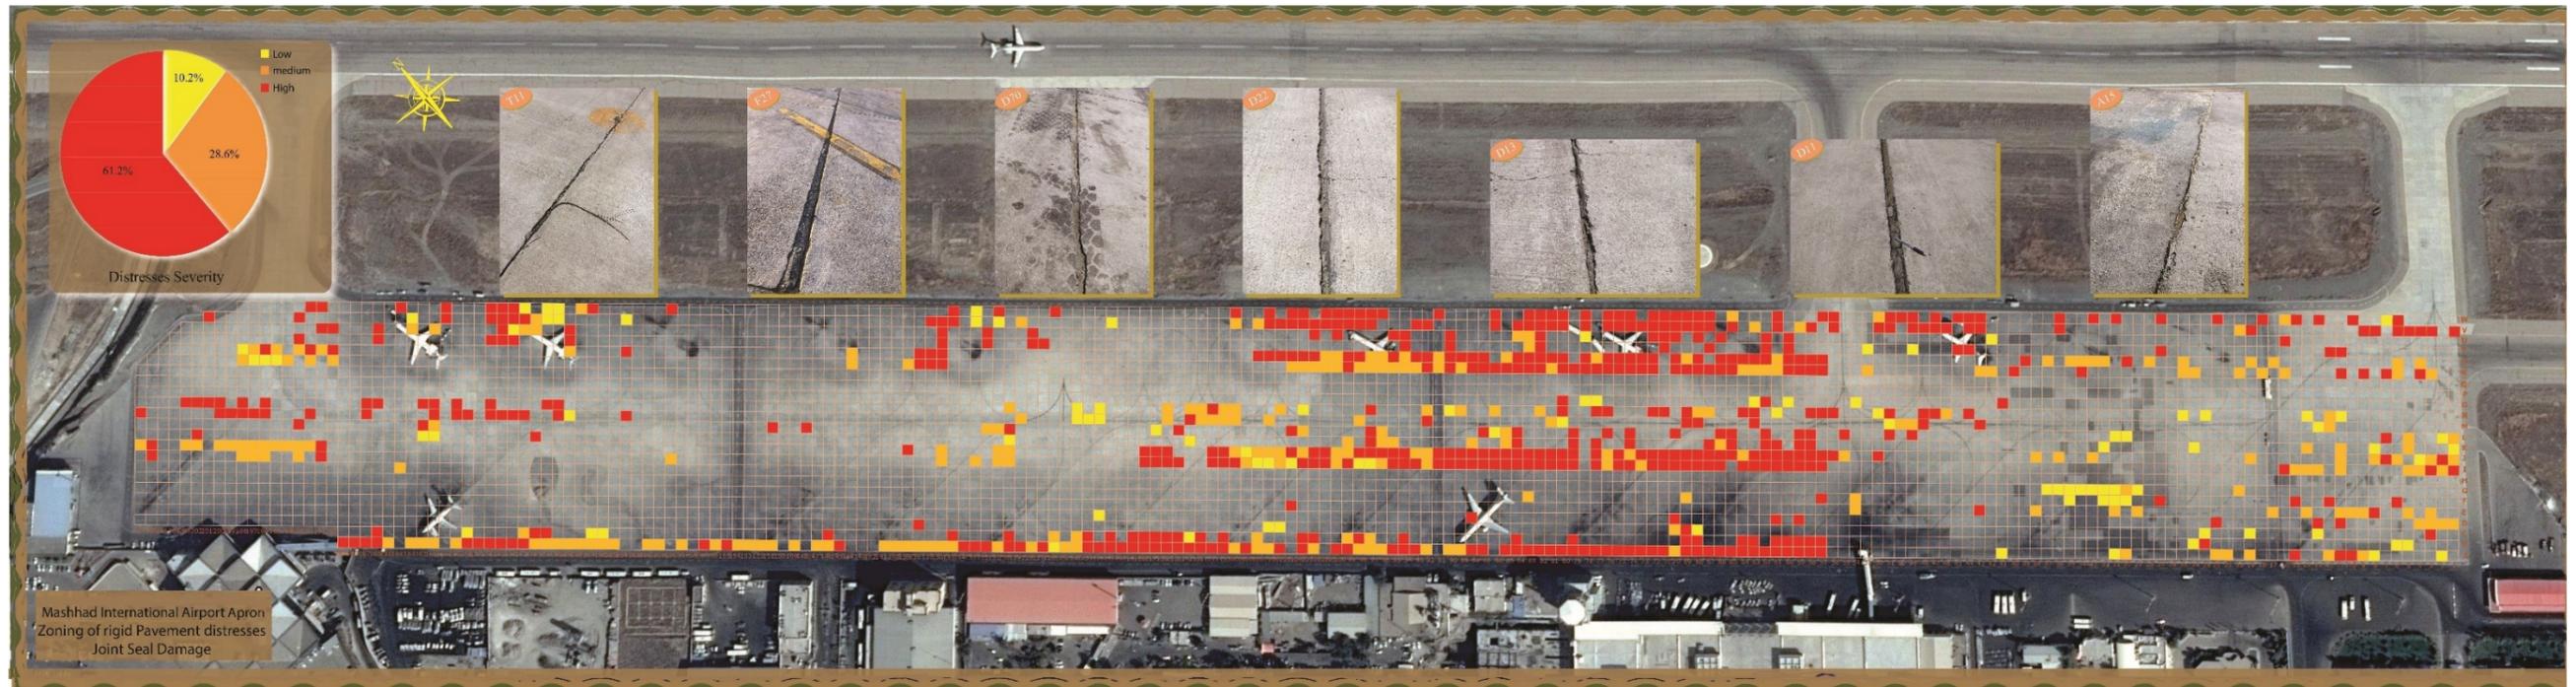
Zoning Map for the slabs distress severity containing join seal damage
